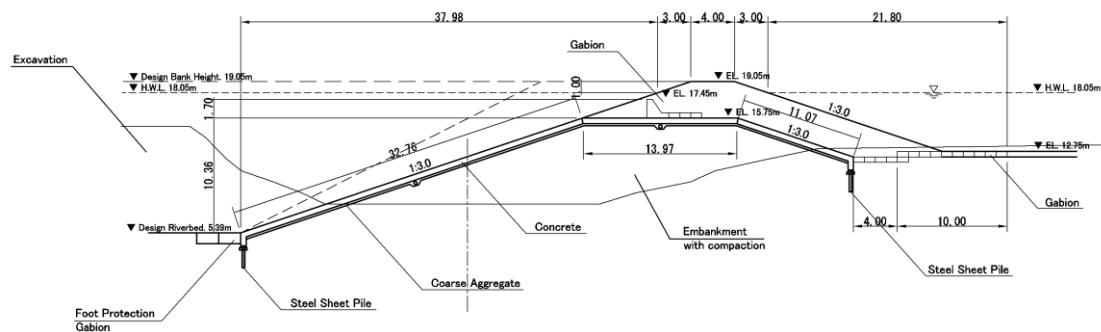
Typical Cross Section of Overflow Dike for Retarding Basin B
